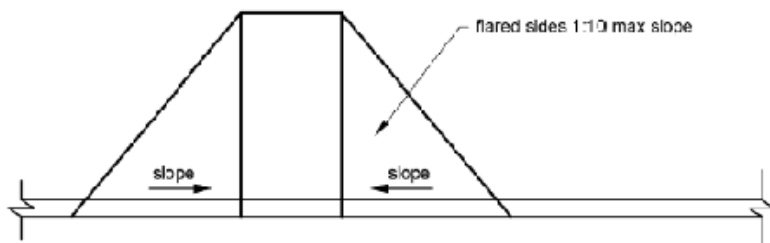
Counter Slope of Surfaces Adjacent to Curb Ramps
